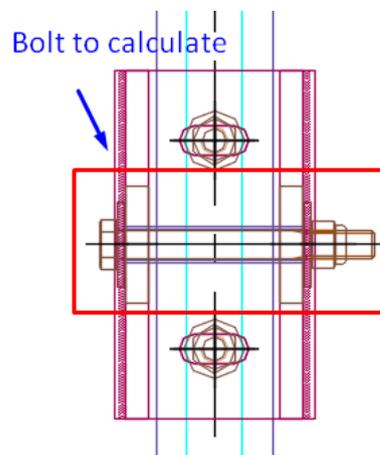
Bolt to calculate for bracket KR-2
